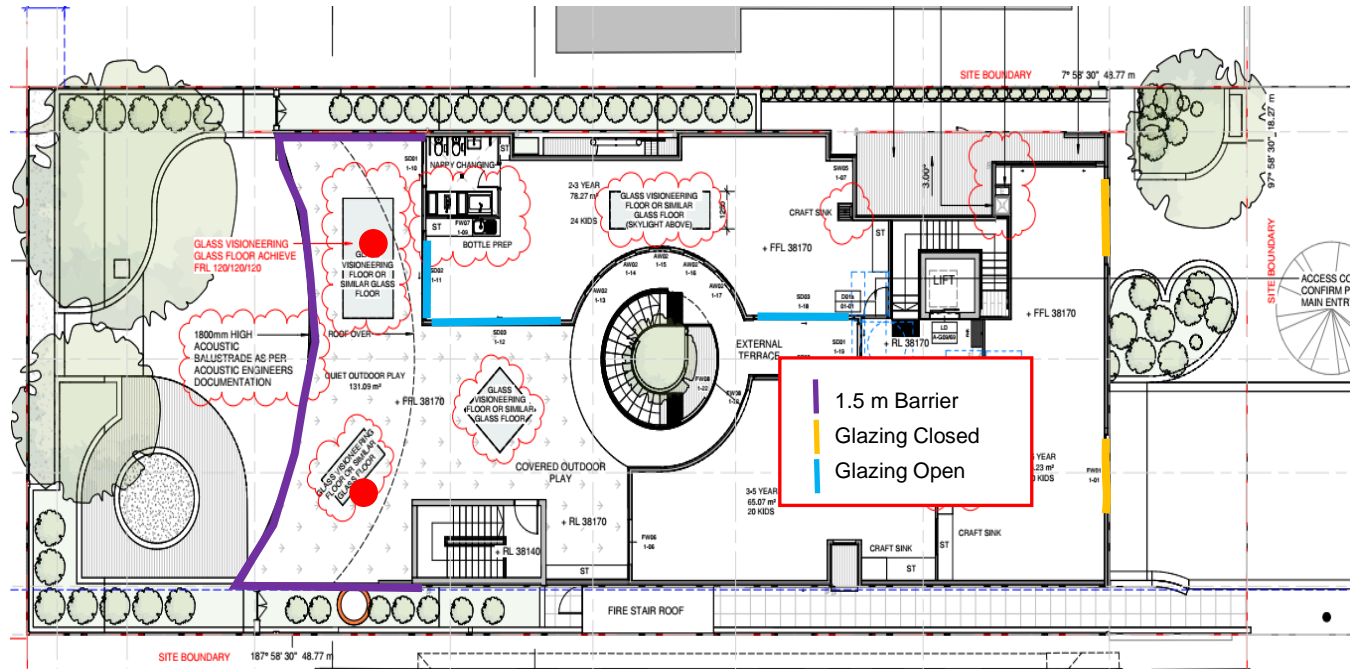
Proposed Child Care Centre Layout – Level 1
